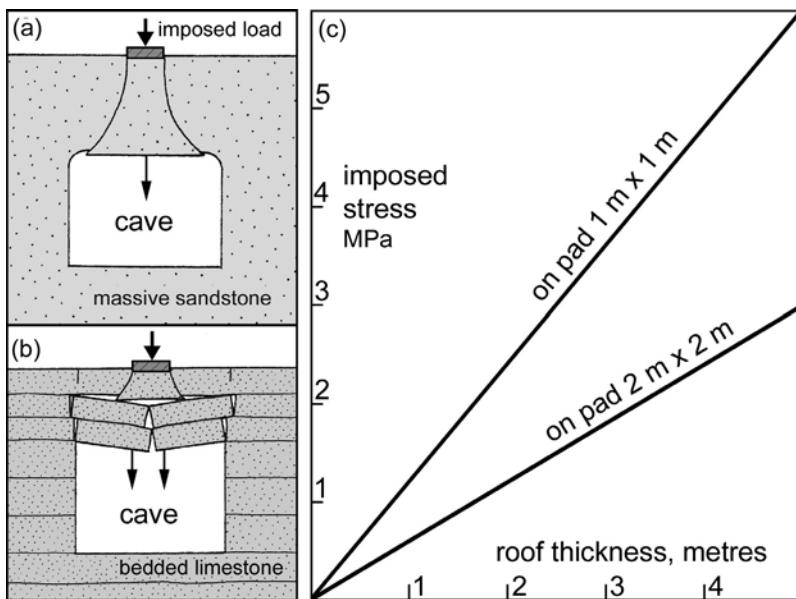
Plug failures over caves. (a) Typical plug profile in homogeneous rock. (b) Typical complex failure in bedded and fractured rock. (c) Bearing capacity on limestone with respect to plug failure over a cavity, in terms of the size of foundation pad and the thickness of sound roof rock; the values have a safety factor of 5, and the rock mass has a shear strength of 3 MN/m^2 .
